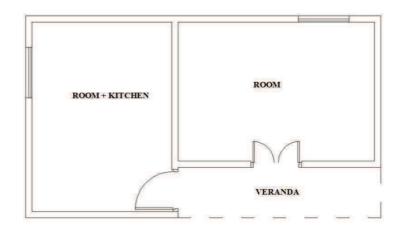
A generic house plan found in the surveyed houses. ERRA prosed the core house with 250-400 sq ft
